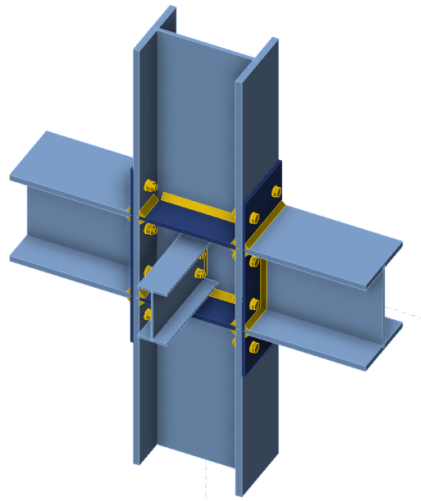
Detail of a semi-rigid connection used in the model building. Column: HEB450; Main beams: HEB300; Secondary beams: IPE240 connection details in Table 6.6
